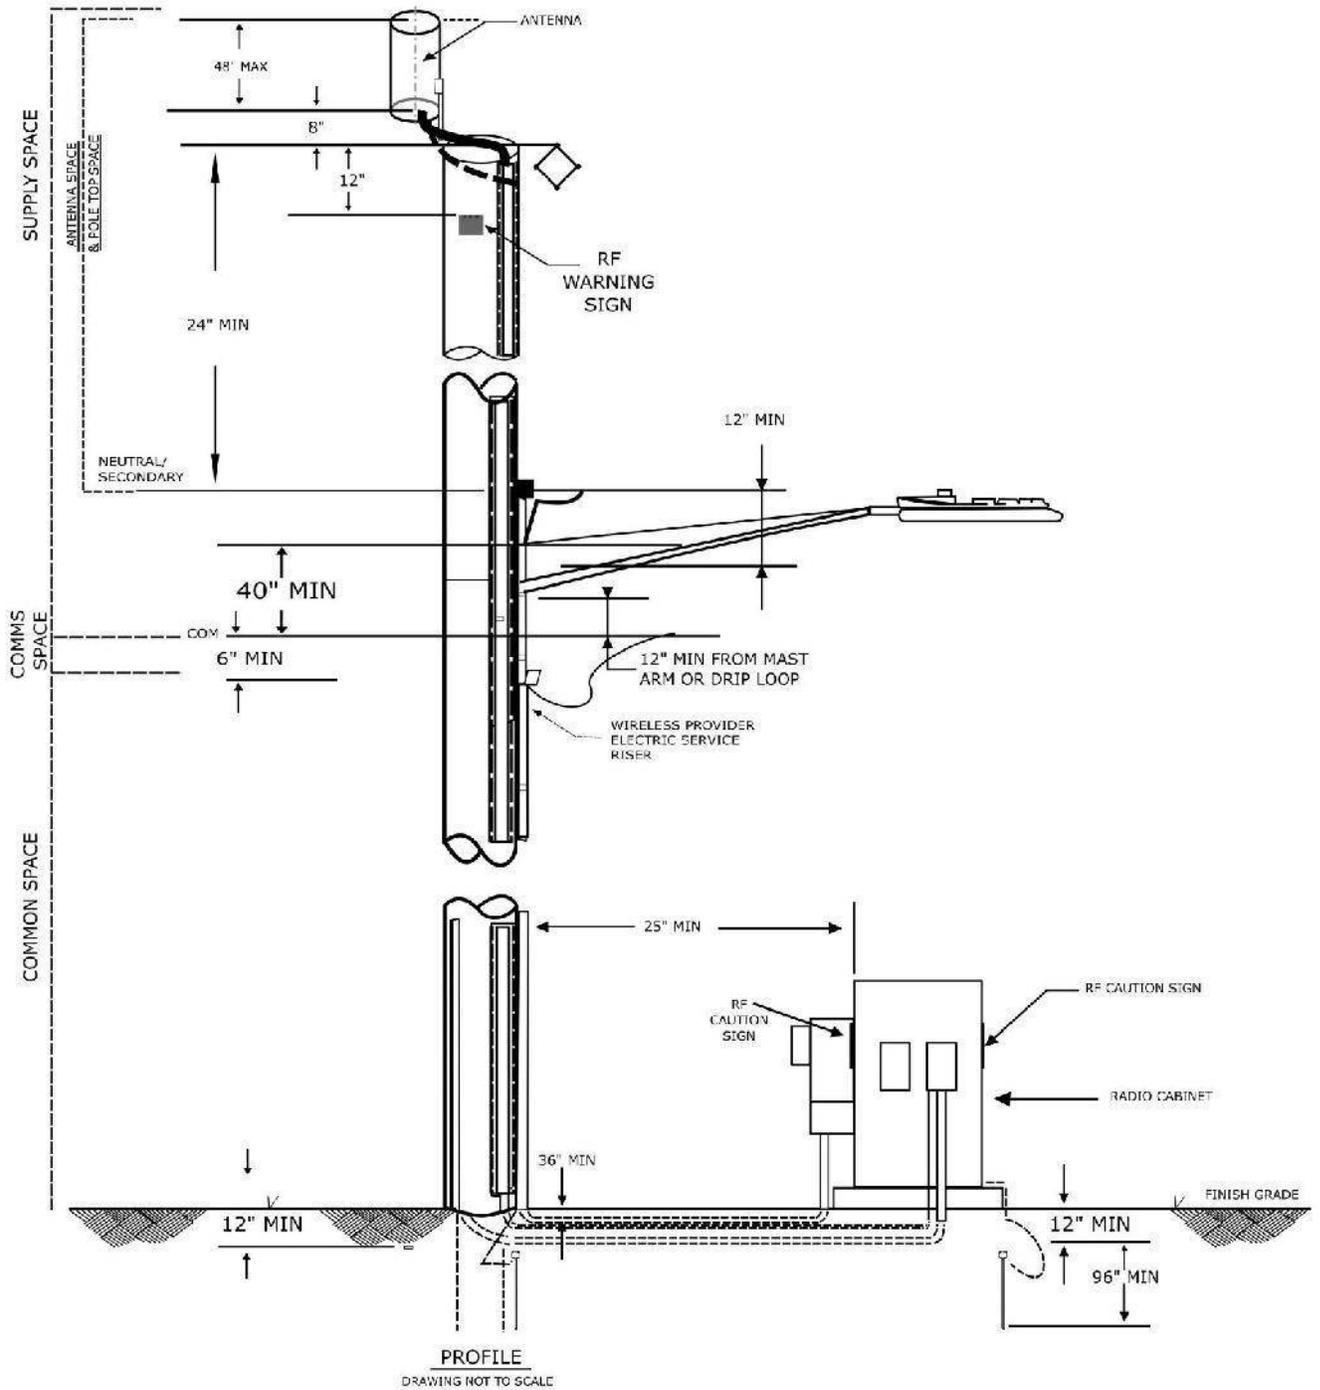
30-foot or 40-foot Streetlight Pole with Antenna on Top and Single Cobra Head and Slab-Mounted Equipment Cabinet
